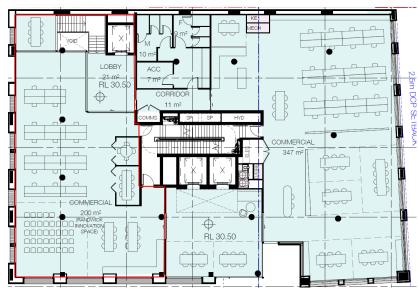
Floor plan showing dedicated community innovation space (marked in red line) (Source: SJB Architect)
